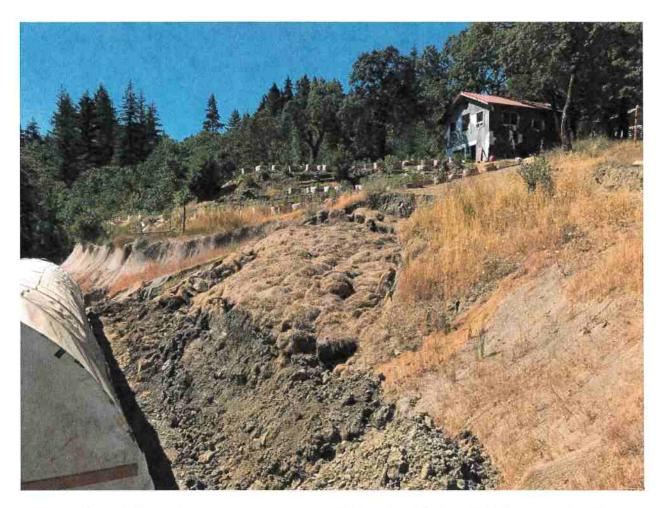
Slope failure adjacent to cultivation area. Photo taken July 12, 2018 at lat/long 40.2271, -123.9584.
